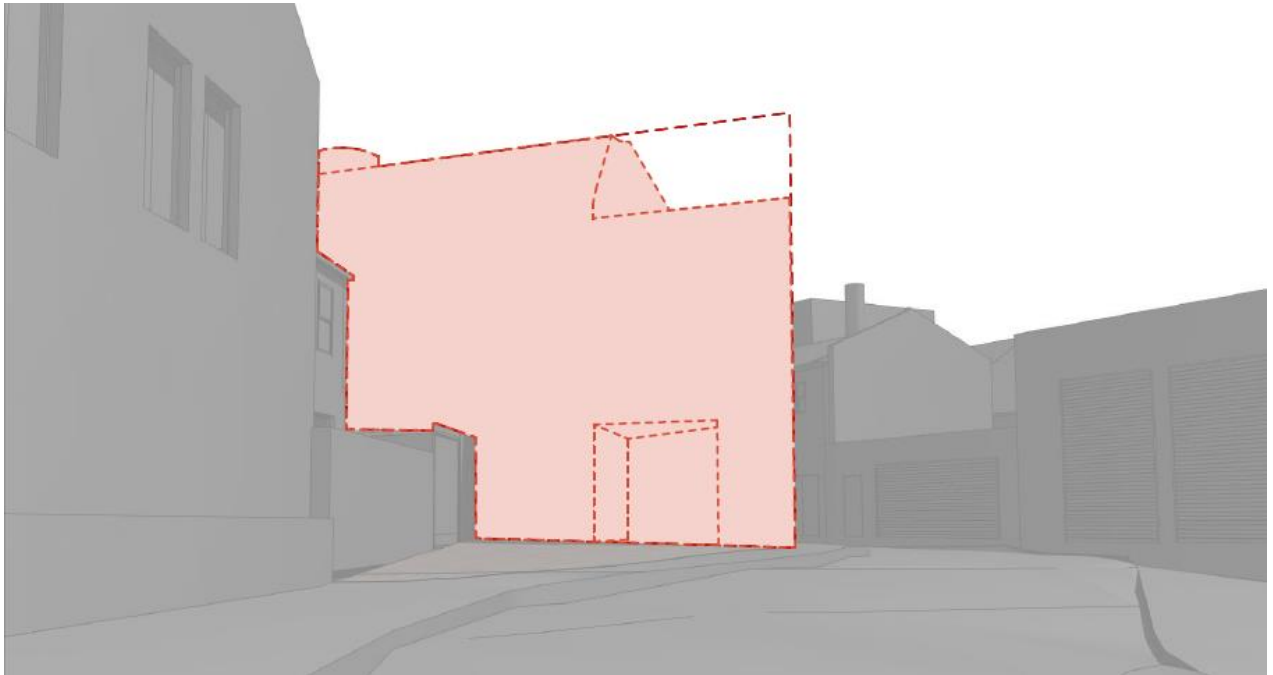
Reference scheme perspective as viewed from Craigend Street looking south
